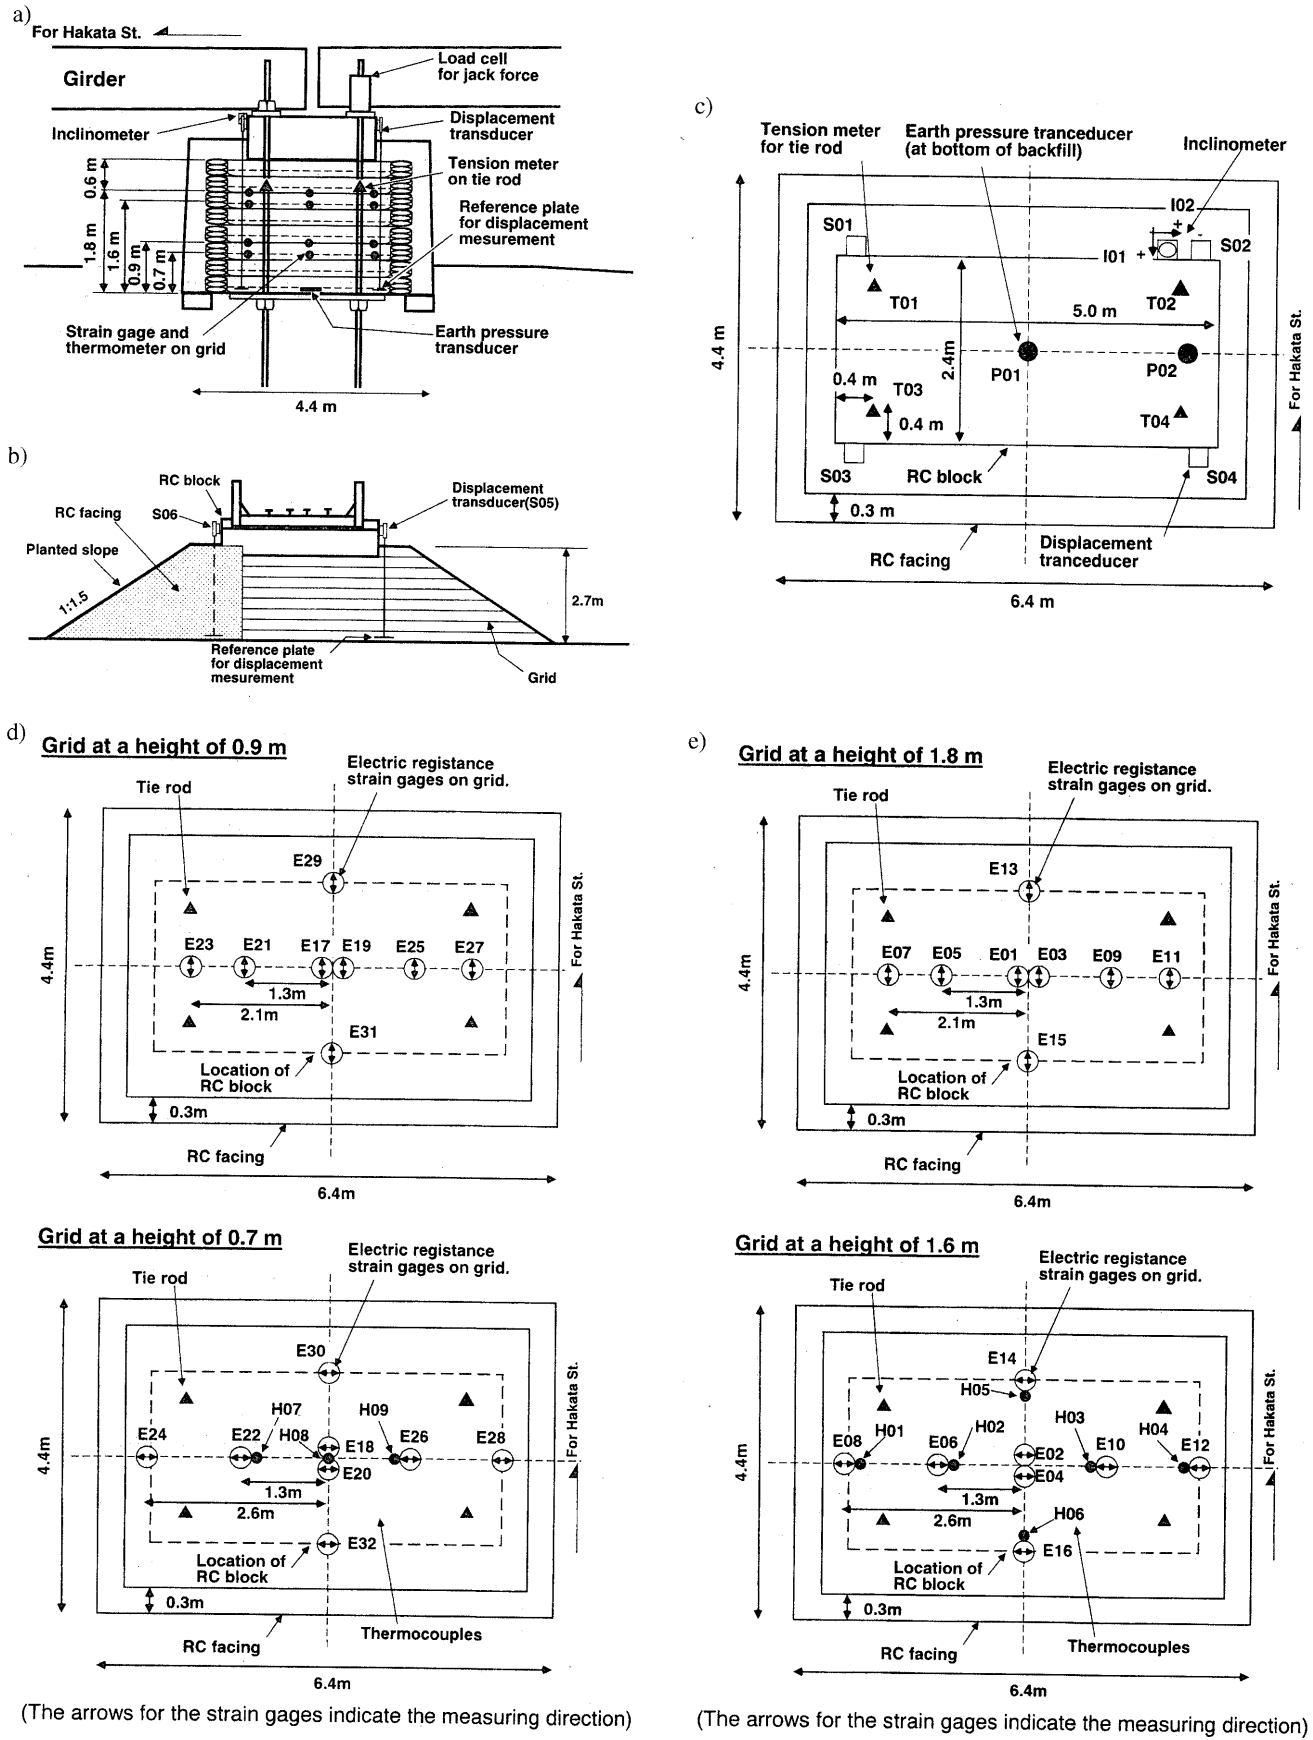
Instrumentation for measurement: a) elevation view of the pier, b) elevation view of the abutment, c) plan view of the pier and d) and e) plan views at several levels of the pier (the arrows for the strain gages indicate the measuring direction)
